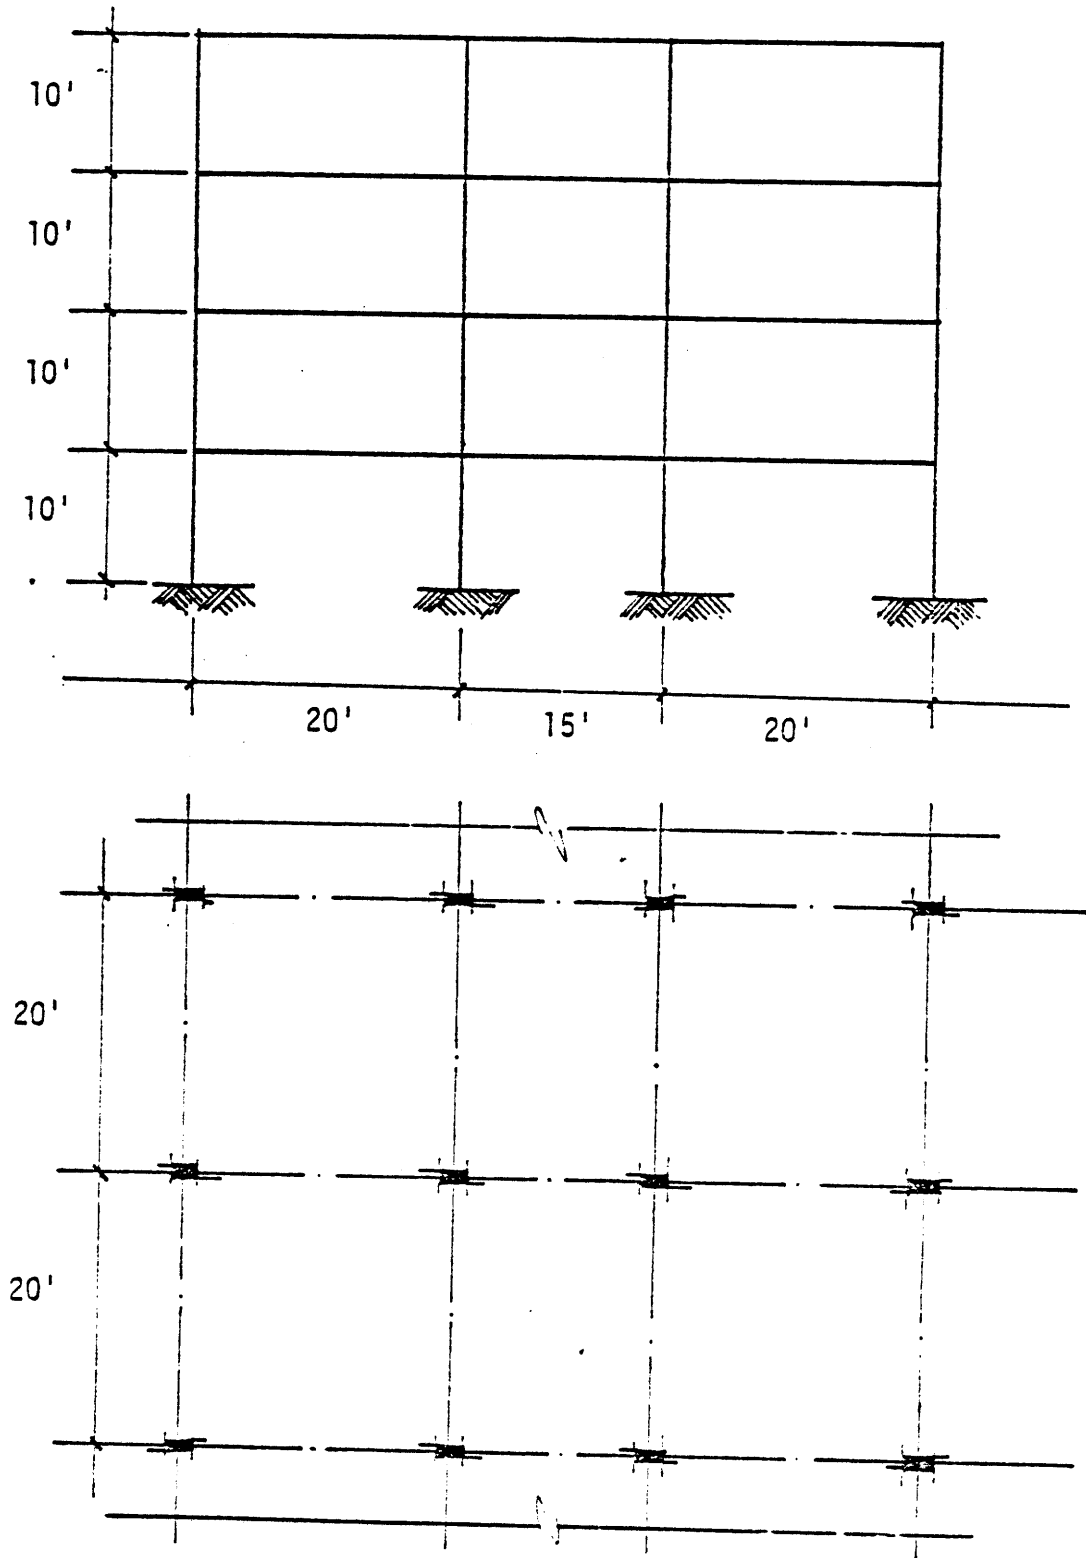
ELEVATION AND PLAN VIEW OF 4-STORY BUILDING FRAME
